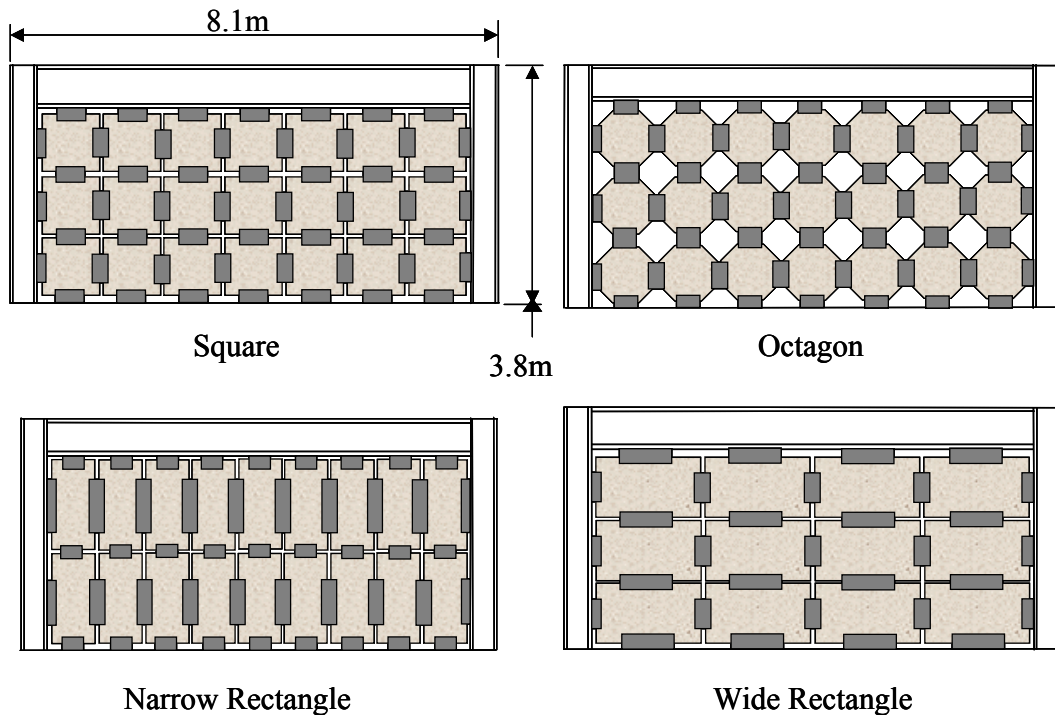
Infill panel geometries examined. All frames have the same dimensions.
